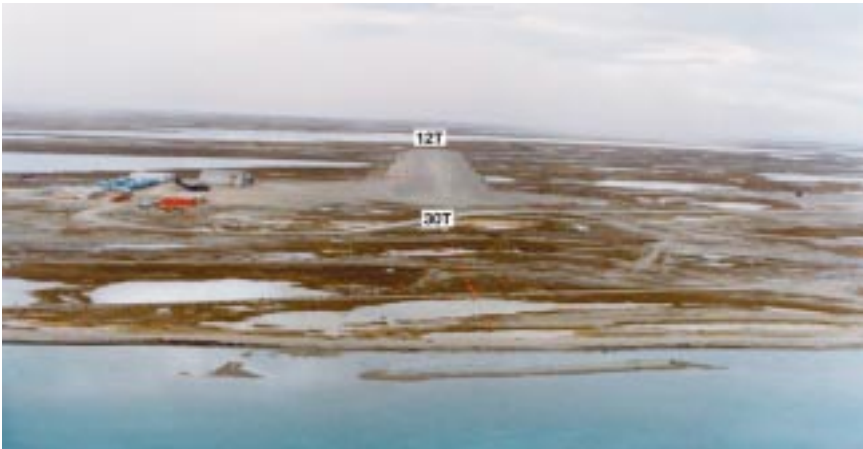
Hall Beach, on approach to runway 30T, September 2000, looking northwest.
